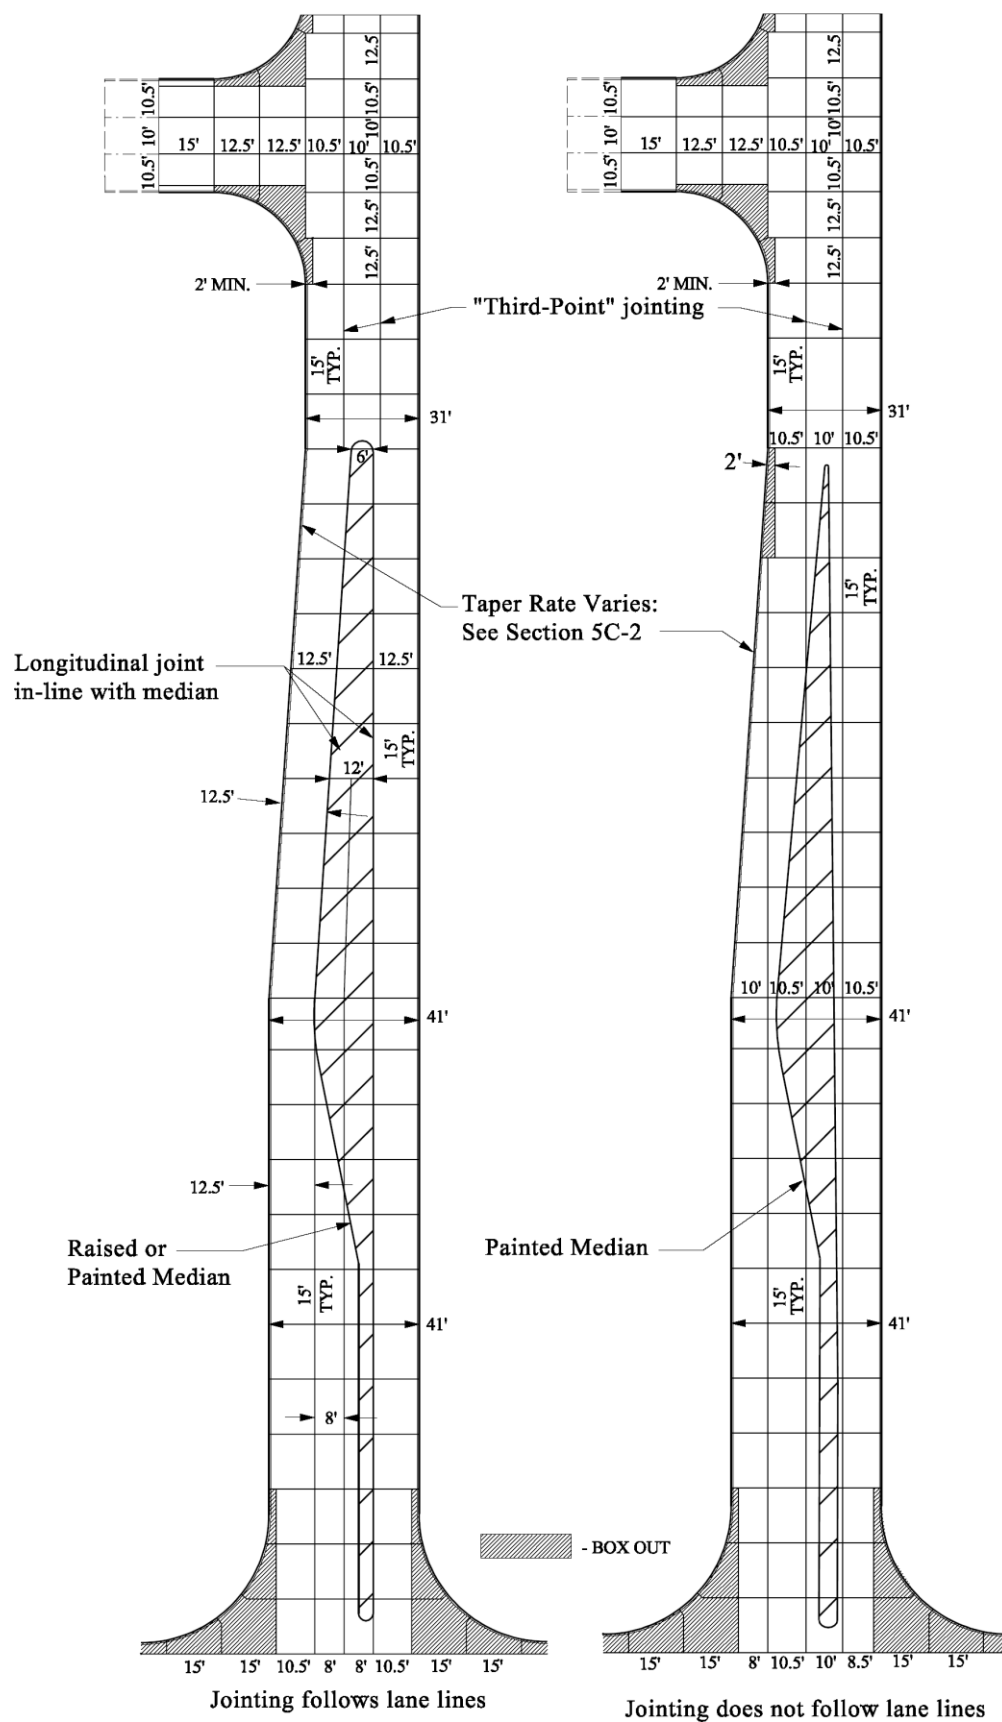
G-3.07: Third-Point Jointing - Widening One Side (31 Foot to 41 Foot)
